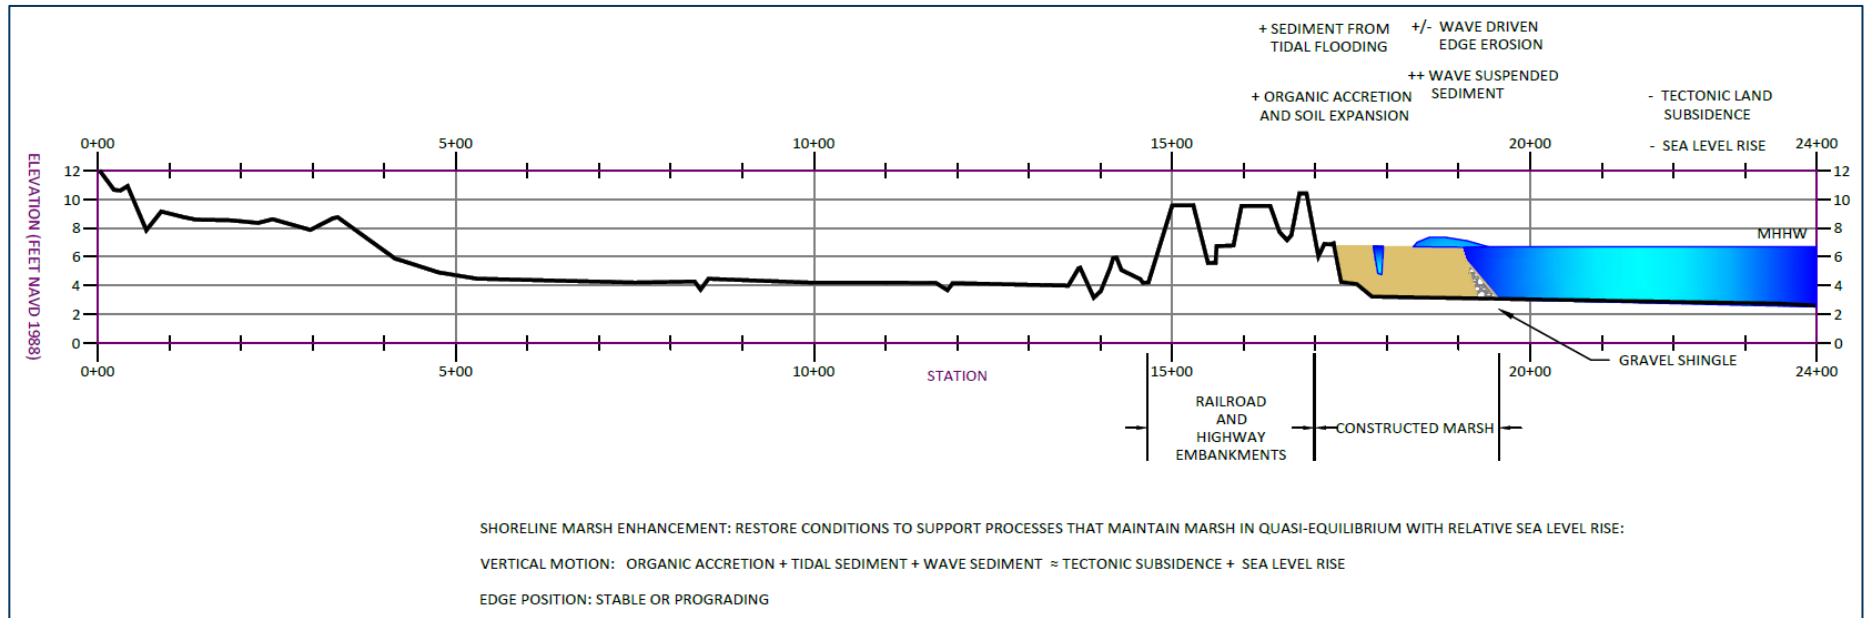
Conceptual project area cross-section showing apparent best alternative of gravel shingle beach and salt marsh
